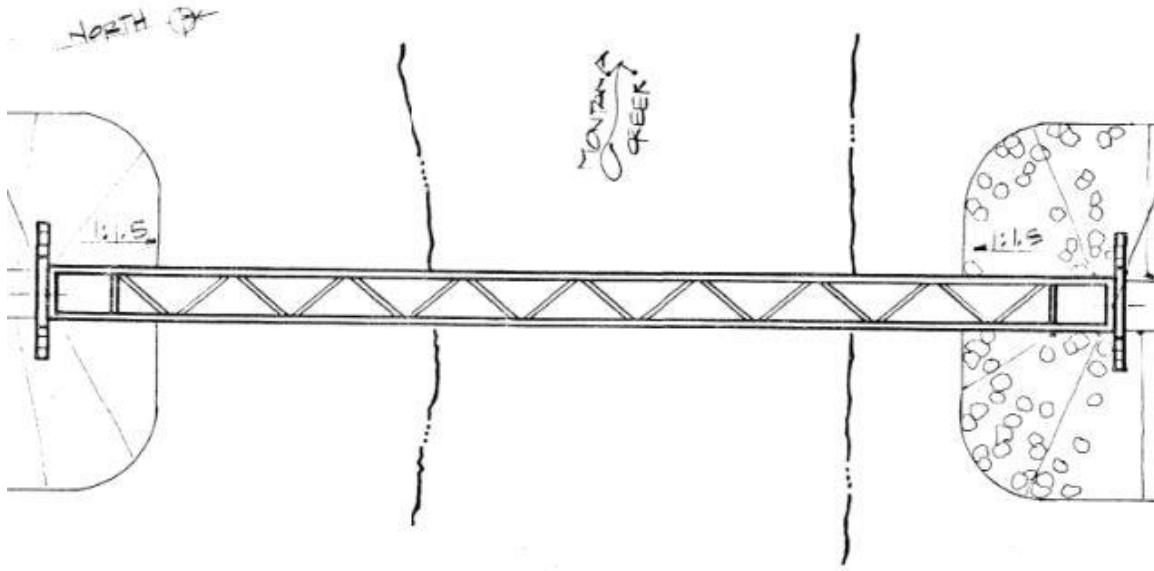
RELOCATED BRIDGE PLAN (SHOWN AT MONTANA CREEK)
